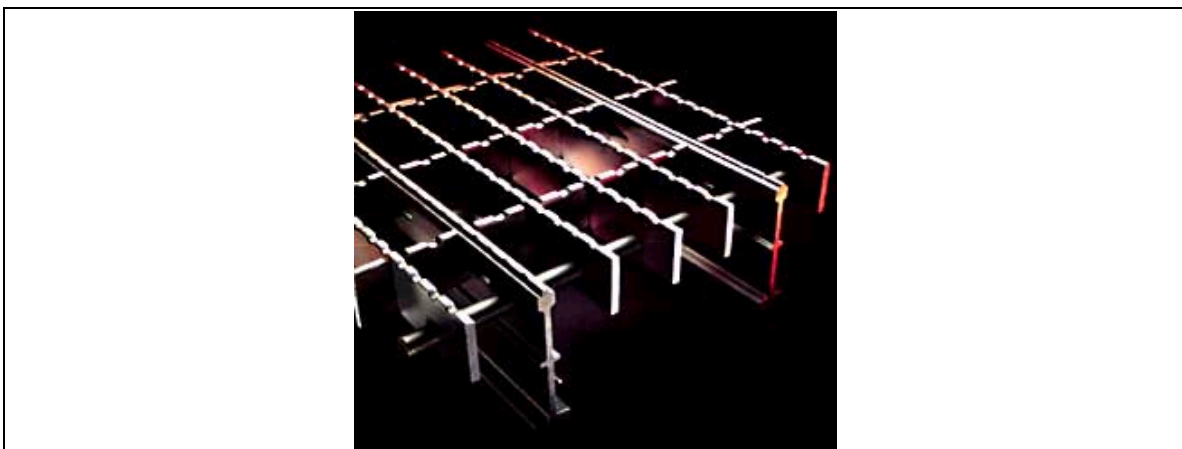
Weld-less steel open grid deck (IDSI, 2003)
